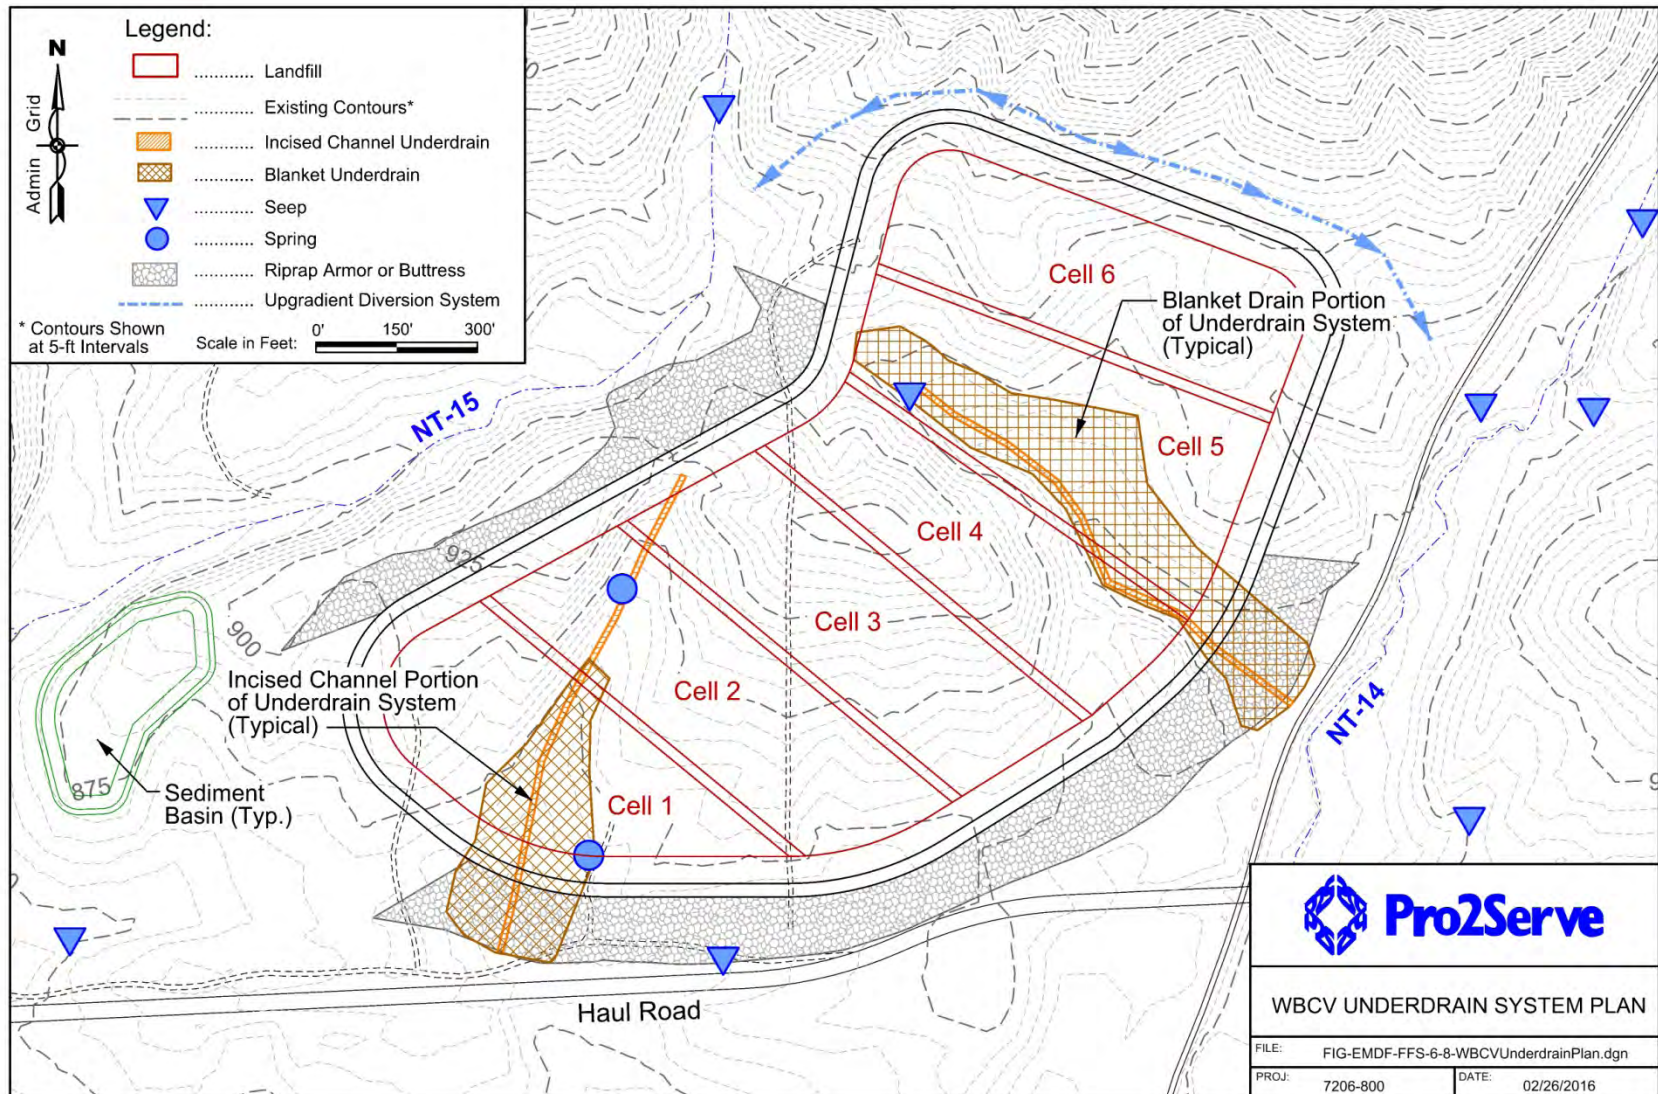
WBCV Site, EMDF Underdrain System Plan
